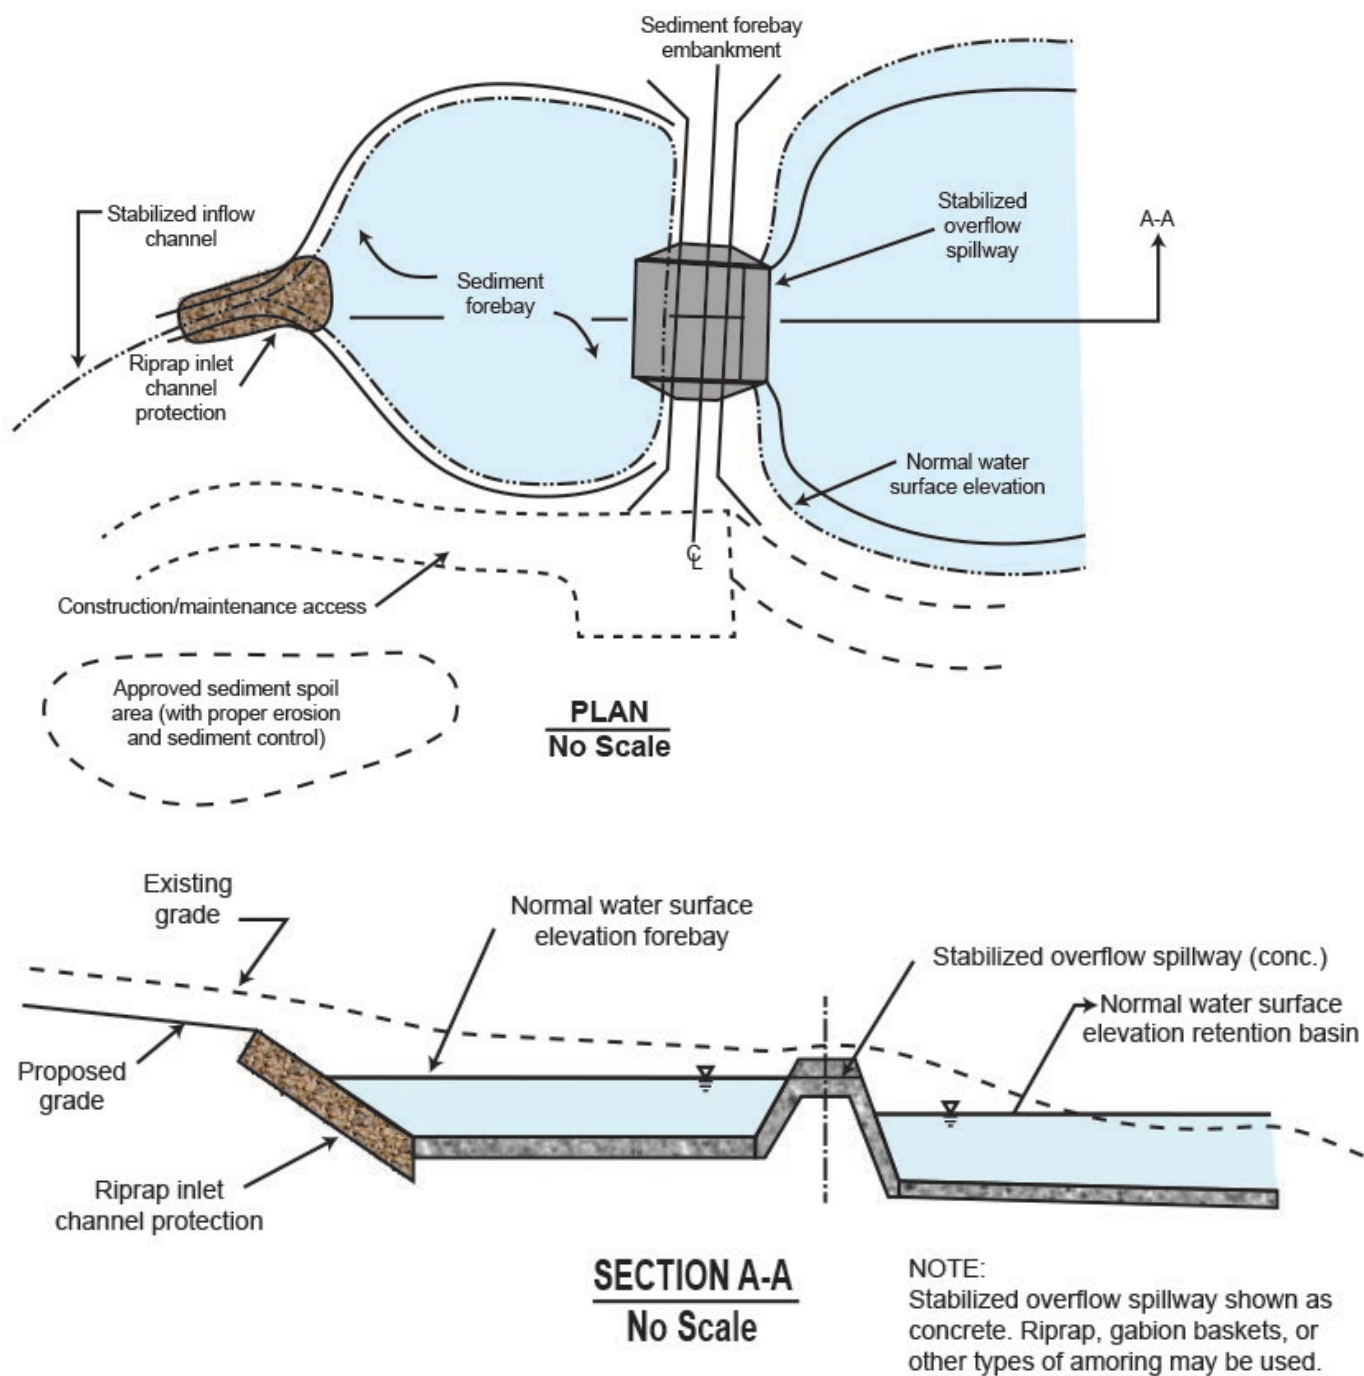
Sedimentation forebay plan and section (VA DEQ 2011).
